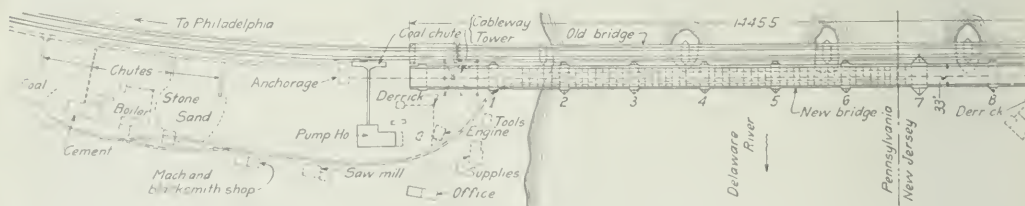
Plan of Bridge Over the Delaware River on the Philadelphia & Reading, Showing Contractor's Plant.
